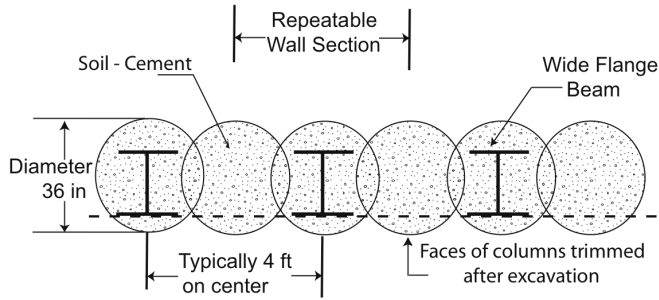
Typical arrangement of DSM columns. (Rutherford et al., 2007).
